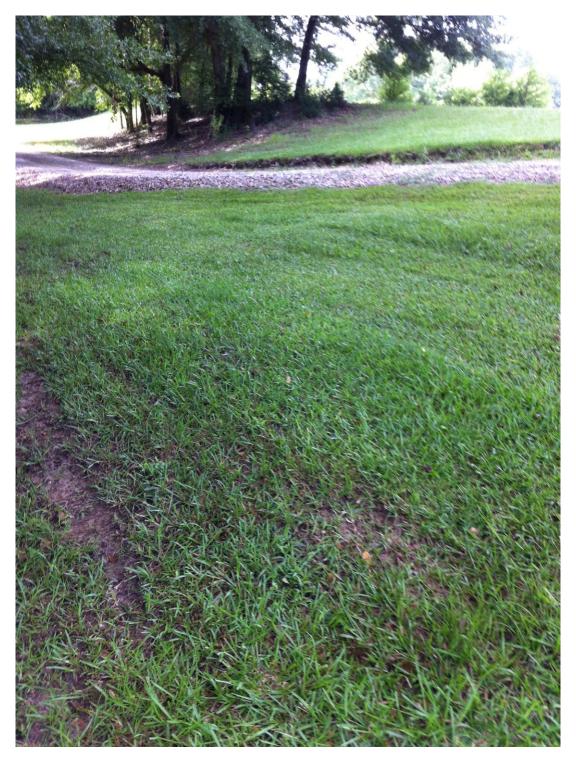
Looking east across top of dam and front slope from near right (west) end of dam.
